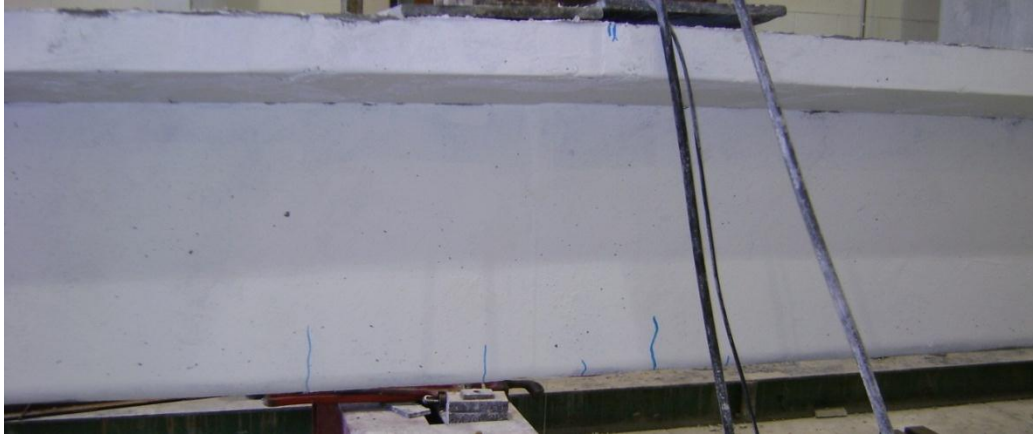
First cracking in development length testing of T-girder specimen
